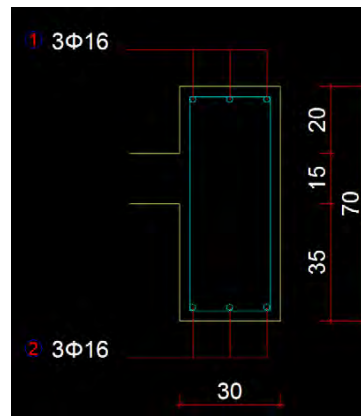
Beam Reinf. Plan of 4 St. Build.
